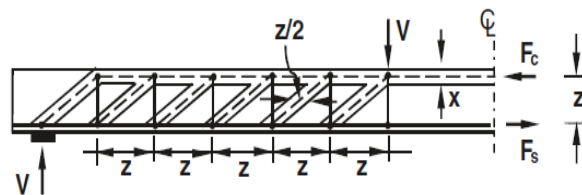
Truss modelling function of an RC beam at its ultimate limit state [140]
